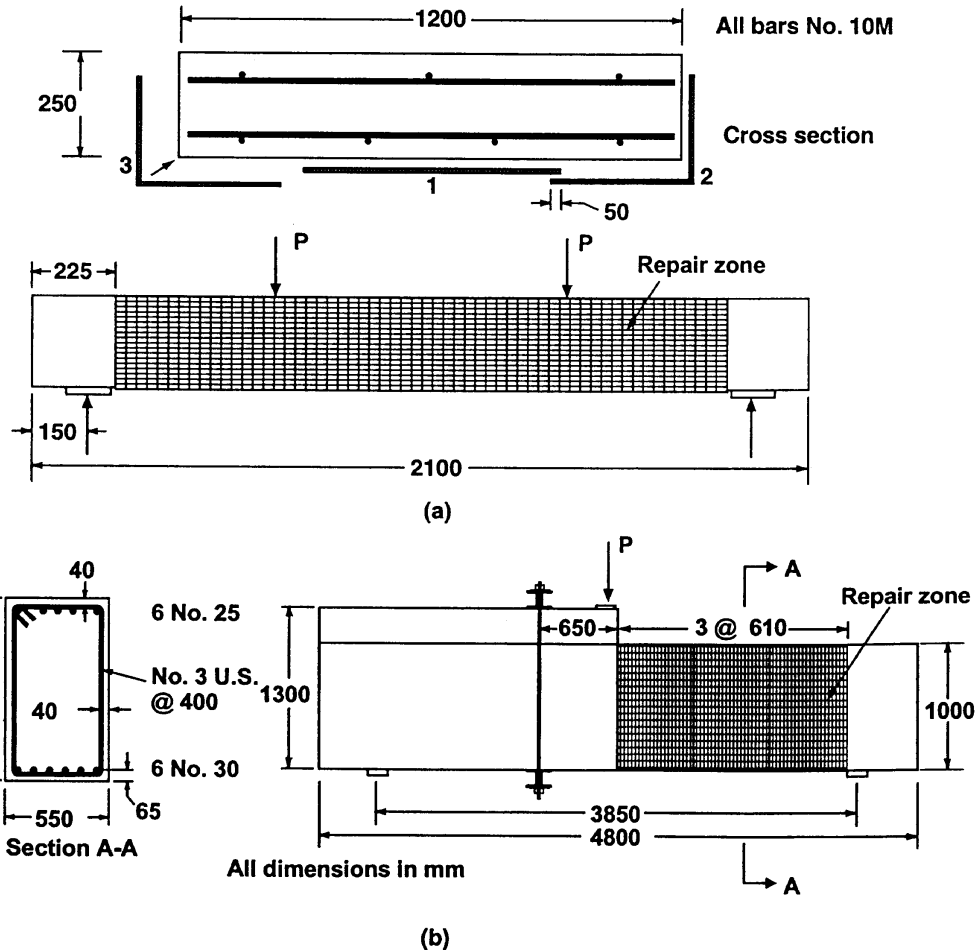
Details of DeRose Specimens: (a) Slab Specimens; (b) Beam Specimens
